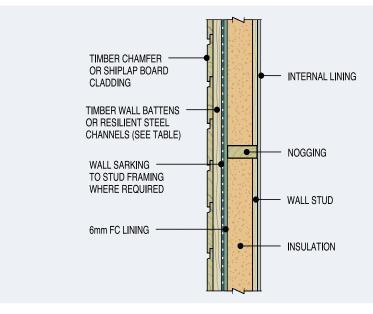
Chamfer Board or Shiplap Board cladding over Fibre Cement. Vertical section through wall
